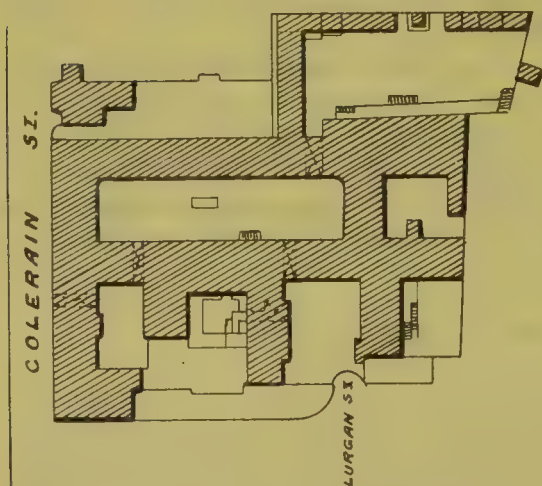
BLOCK PLAN OF OBSOLETE TYPE OF BARRACK.
